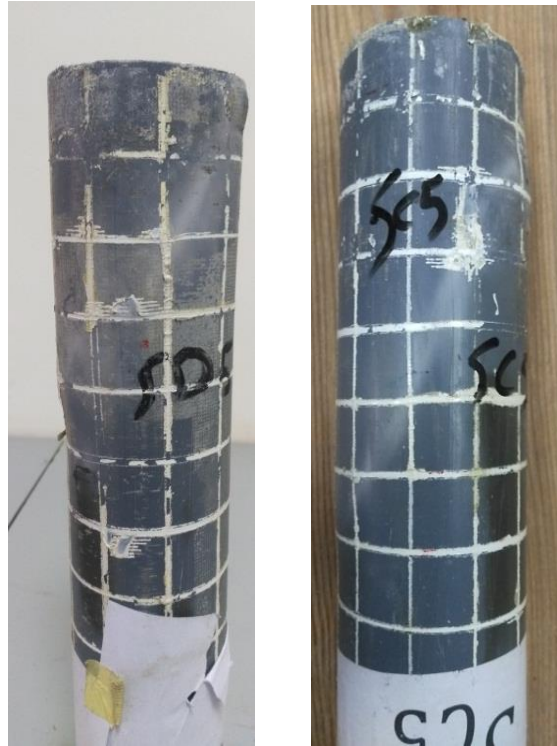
Typical failure modes of short composite specimens SD5 and SC5
